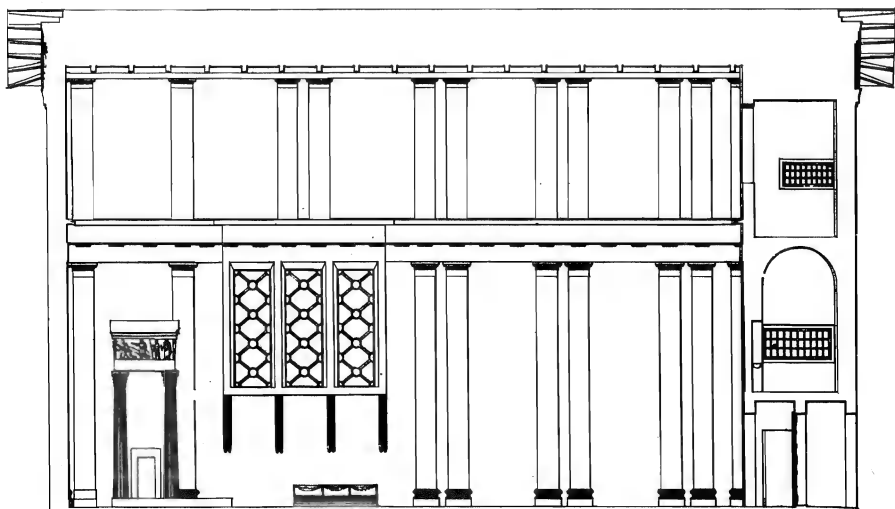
44. Resurrection Chapel, drawing of interior wall.
